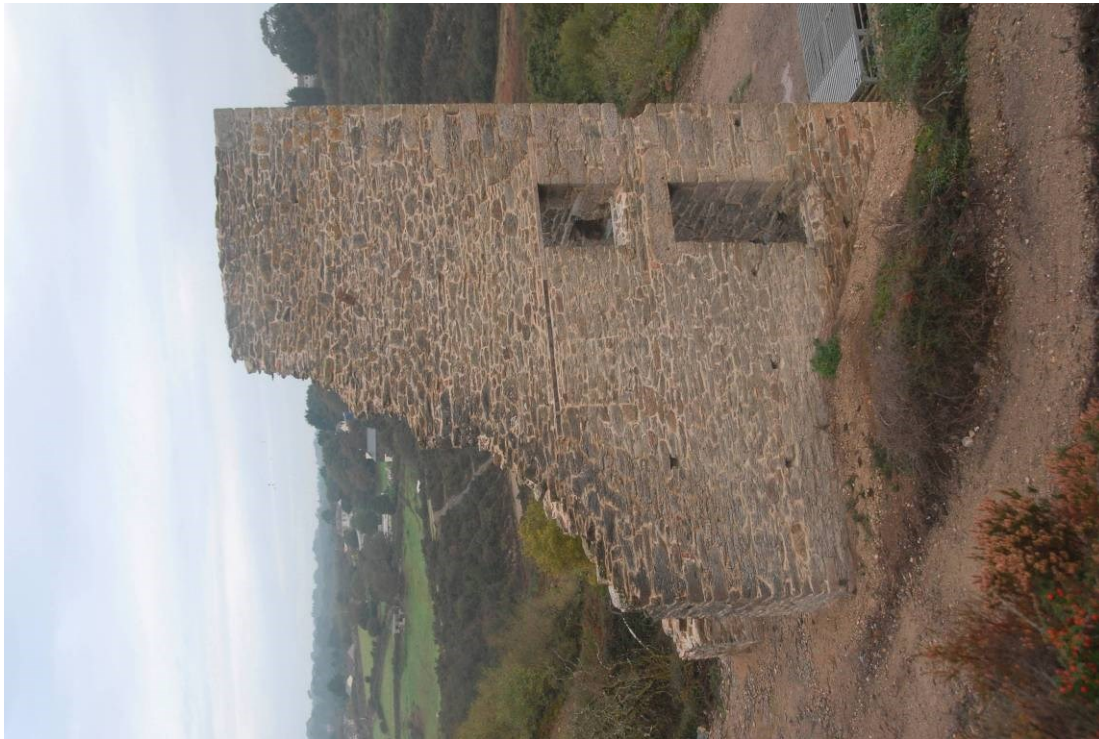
The western internal elevation of Taylor's engine house, showing the reconstructed masonry above the replaced lintel.
